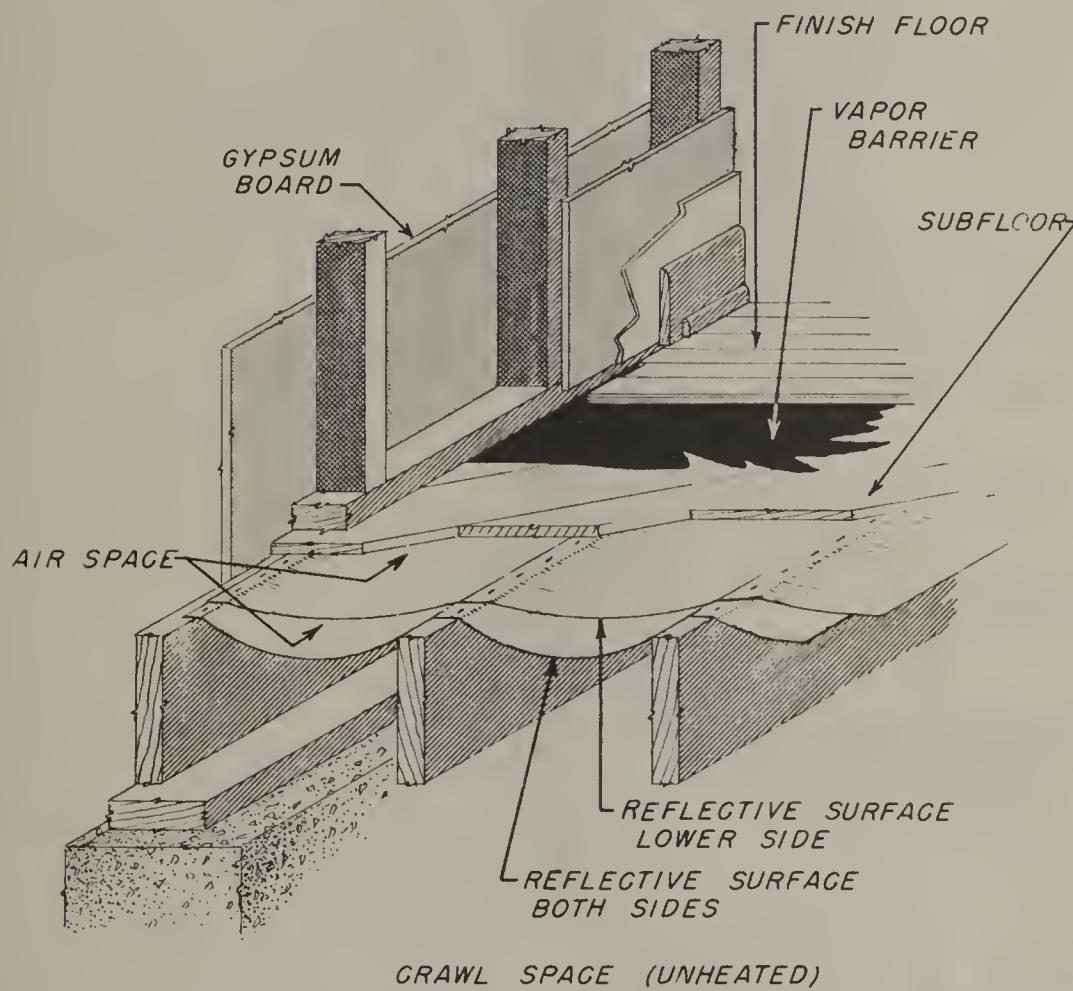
Basementless house, floor detail No. 4.* Condensation control in this detail depends on a vapor barrier between the finish floor and subfloor. Since the temperature of reflective insulation may be low enough at times to condense water vapor, this arrangement is desirable. Thermal insulation of the reflective type shown in this detail may be applied in single or multiple sheets but it is important that an air space of at least three-fourths of an inch be left between it and adjoining surfaces. Cellular reflective insulation could be used in this detail. A reflective surface on the upper side is not necessary since dirt will readily drop between the boards and destroy the effectiveness of the reflective insulation.
